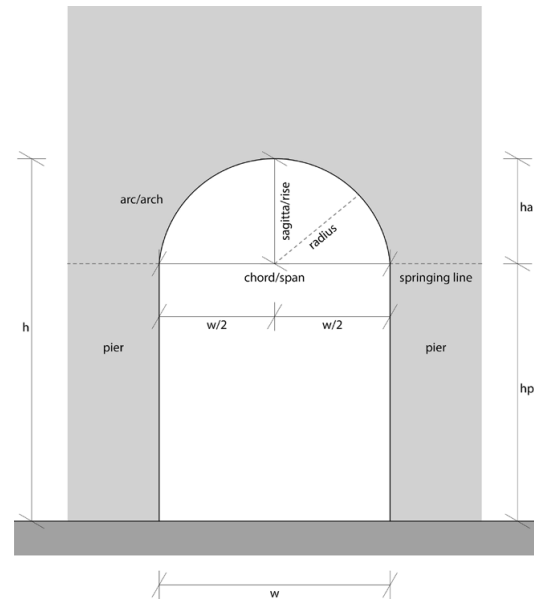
| Elevation of an arched opening, indicating its most relevant parts.
